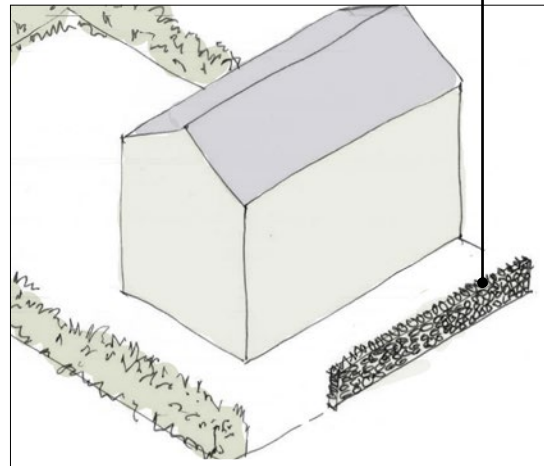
Sandstone walls and/or drystone walls boundary treatment should surround buildings in rural hamlet or in the open countryside
